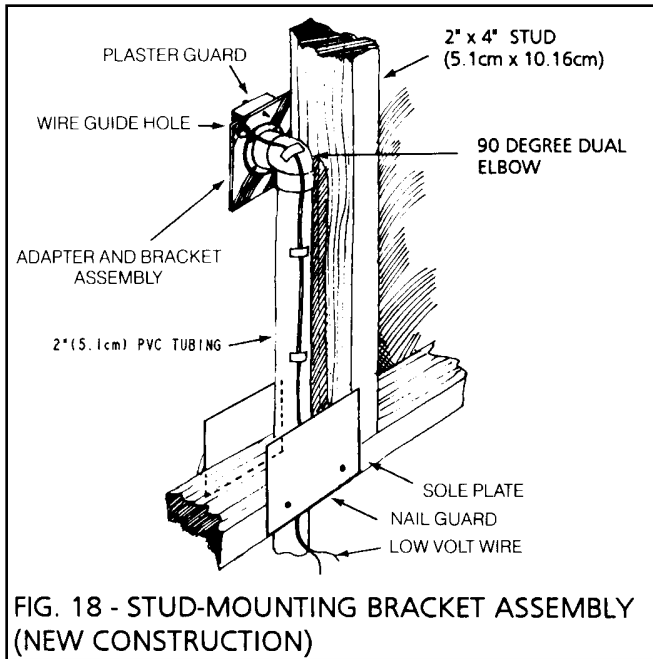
STUD-MOUNTING BRACKET ASSEMBLY (NEW CONSTRUCTION)
